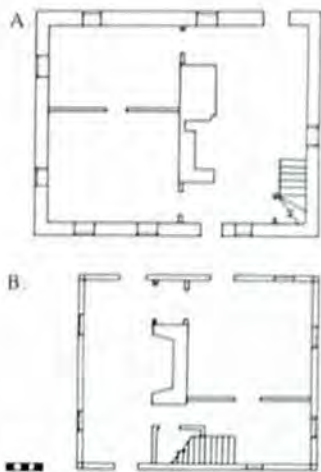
A. Stone Continental plan house, vicinity of Applebachsville, Bucks County, Pennsylvania, built about 1770; B. Log Continental plan house, vicinity of Souderton, Montgomery County, Pennsylvania, built mid-eighteenth century. The stair in B was moved to its present location in the late nineteenth century.
